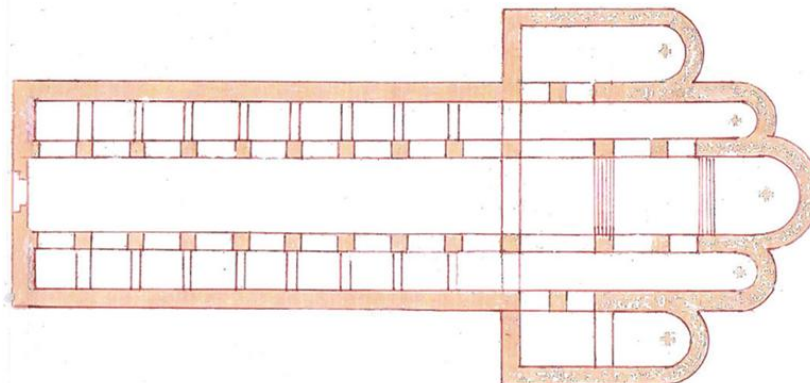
Ground floor plan of Canterbury Cathedral in as built by Archbishop Lanfranc in 1077
